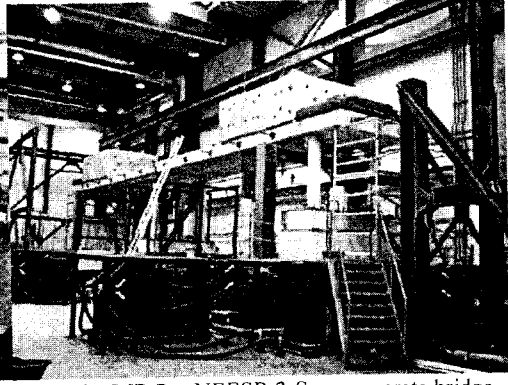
UNR Pre-NEESR 2-Span concrete bridge
